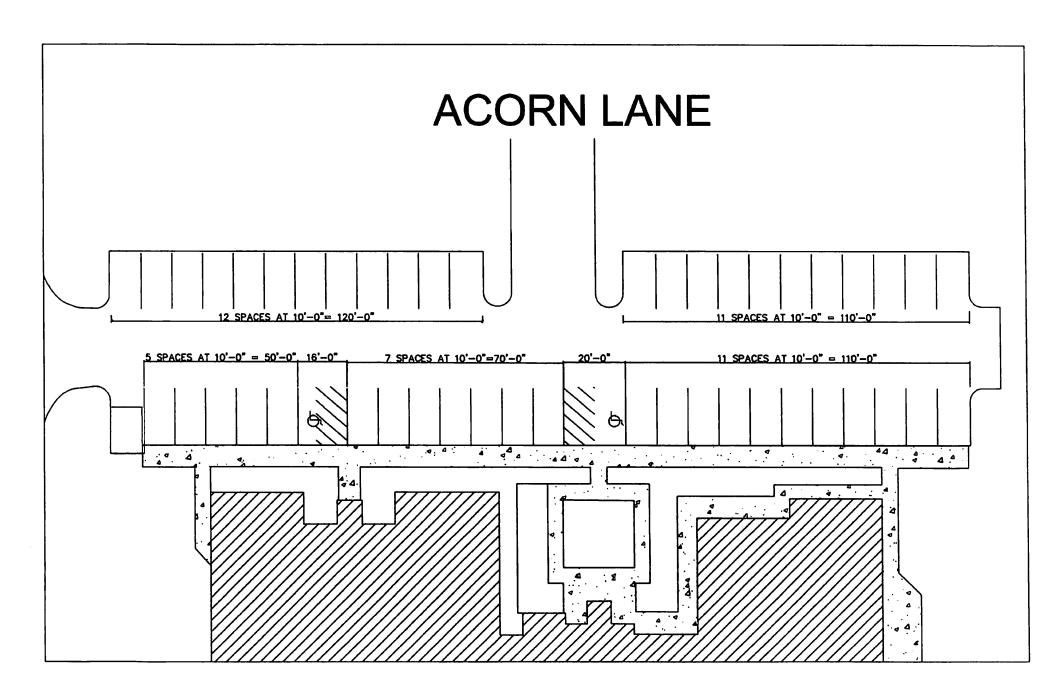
SITE PLAN and PARKING EXHIBIT 40 W. ACORN LANE, LAKE IN THE HILLS, IL
